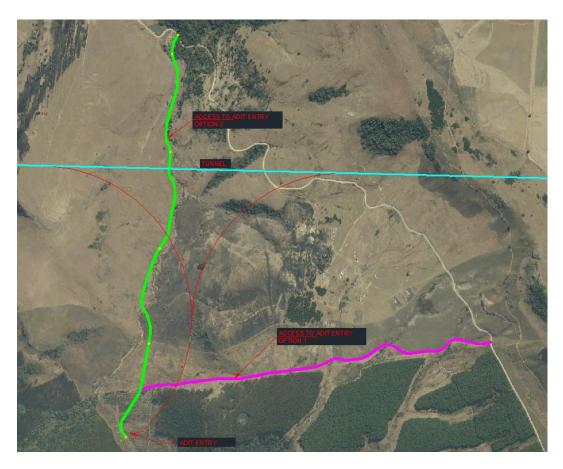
Alternative routes for access road to the tunnel centre adit entry
